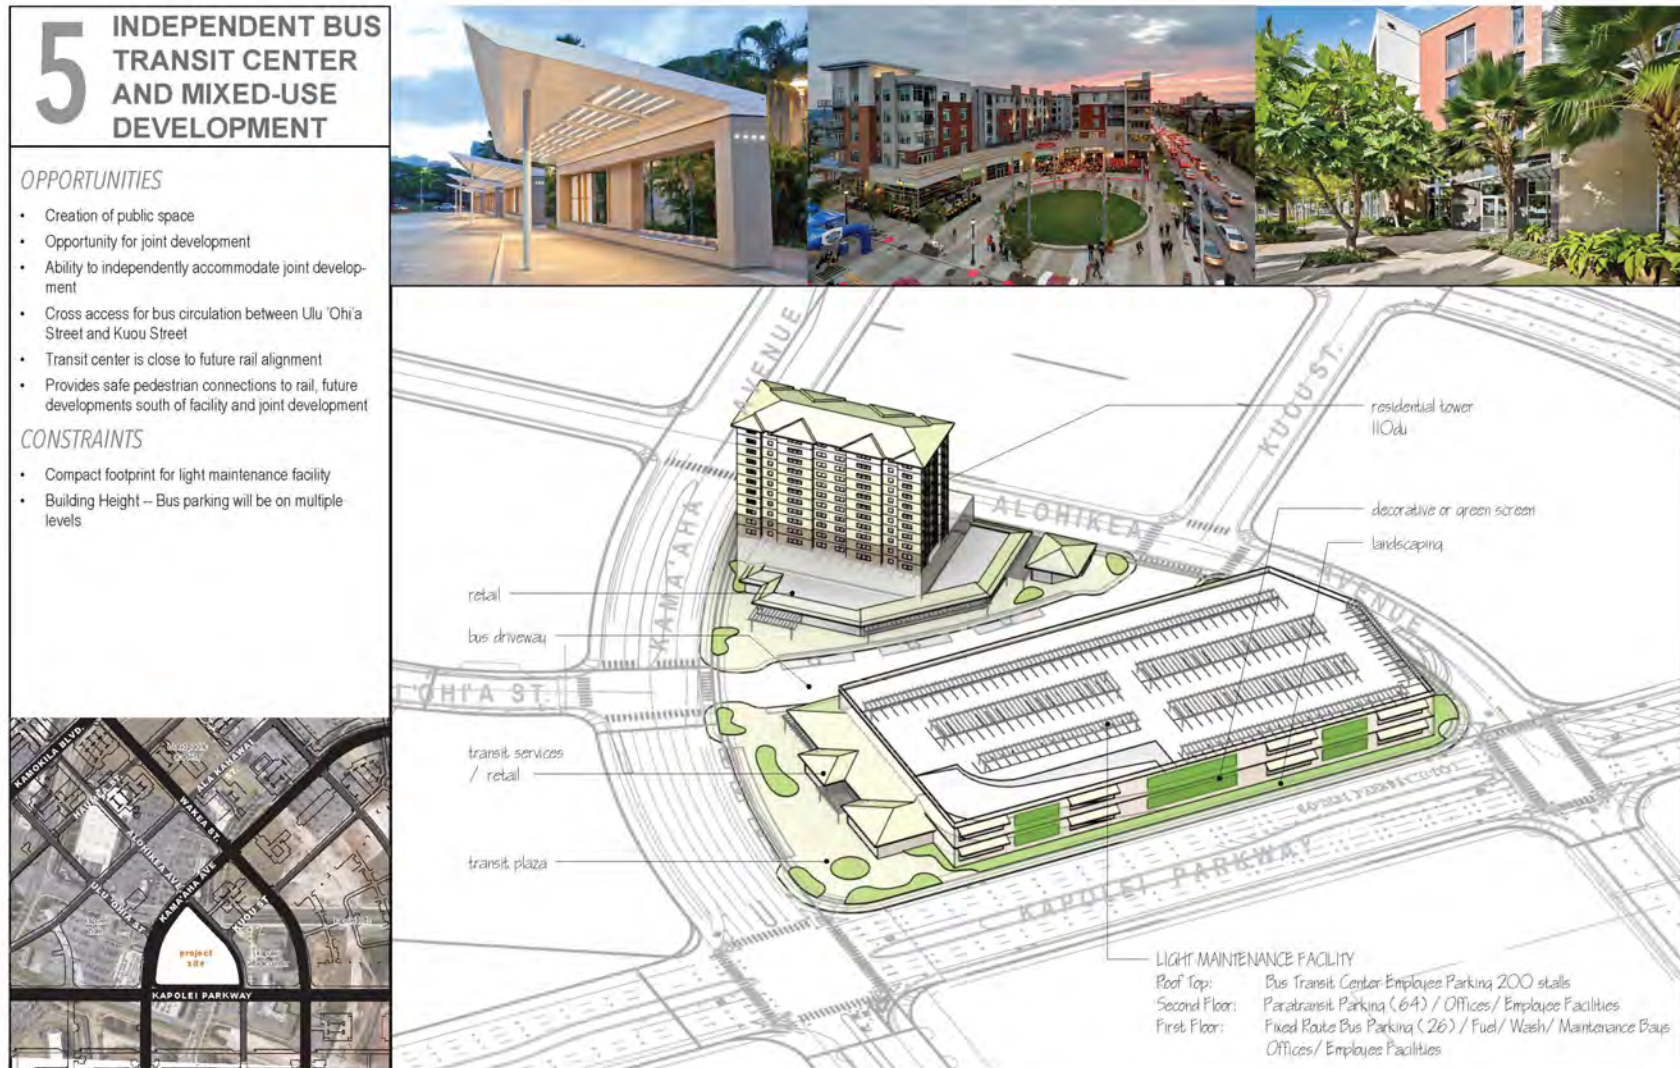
Site Plan and Floor Plans for Refined Option 5: Independent Bus Transit Center and Mixed-Use Development
